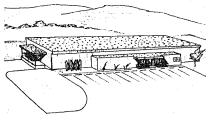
Sketch of egg grading and packing plant facility design.
